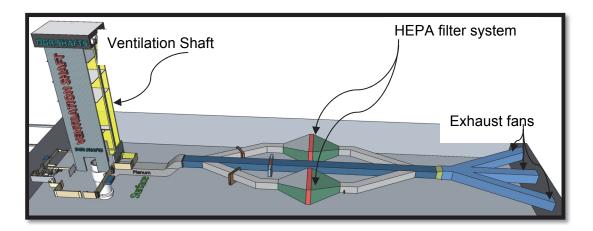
Ventilation Shaft with HEPA Filtration and Exhaust Fans
